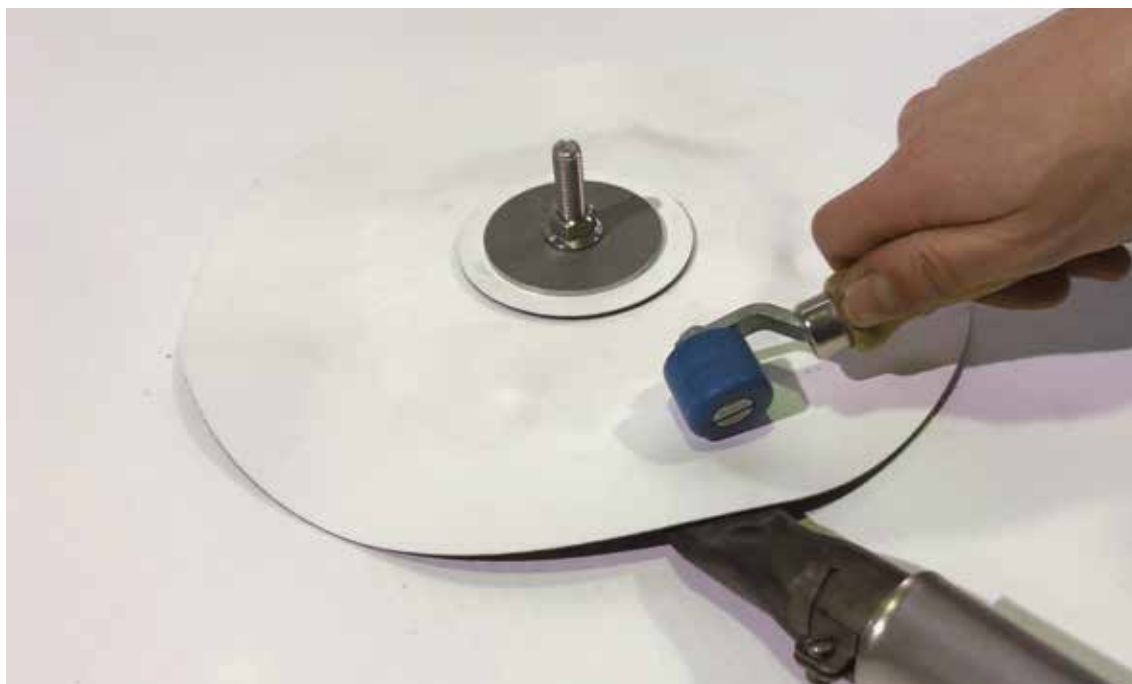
Hot air pre-welding of the Mapeplan® T connection patch
